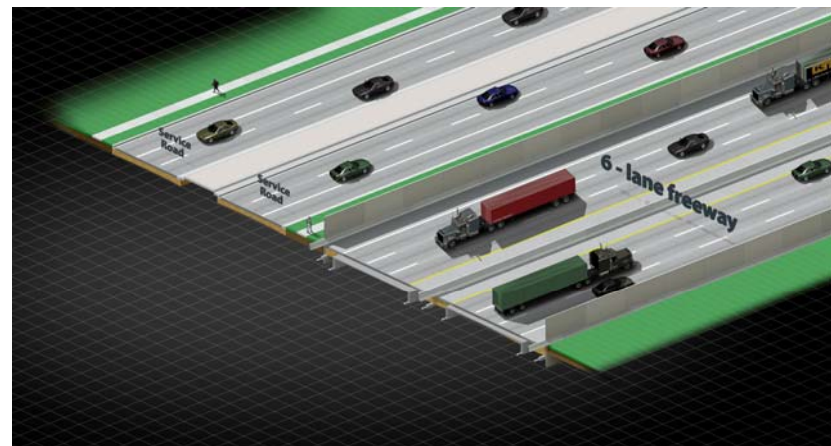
TYPICAL PROPOSED CROSS-SECTIONS – PRACTICAL ALTERNATIVES (NOT TO SCALE)
